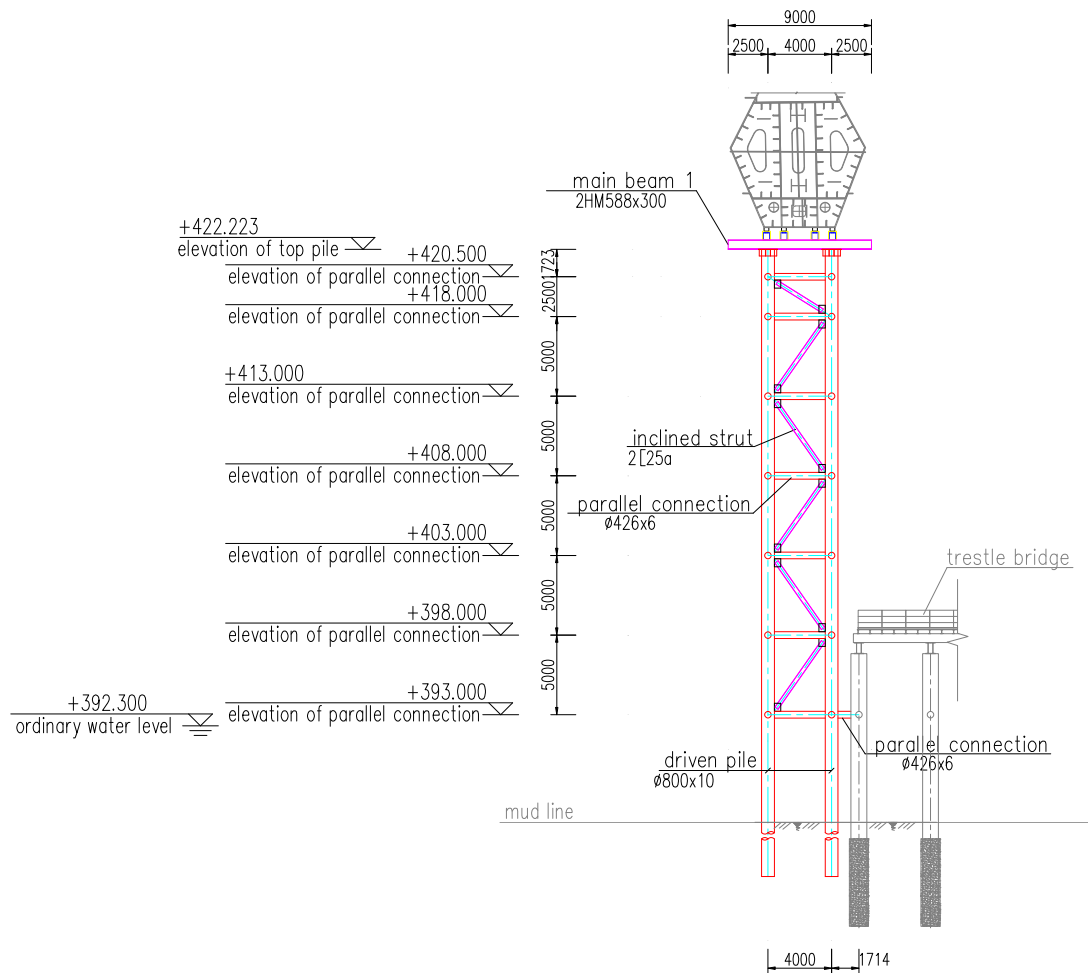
The sectional drawing of the assembling support of the V-shaped lower tower columns on the upstream side
